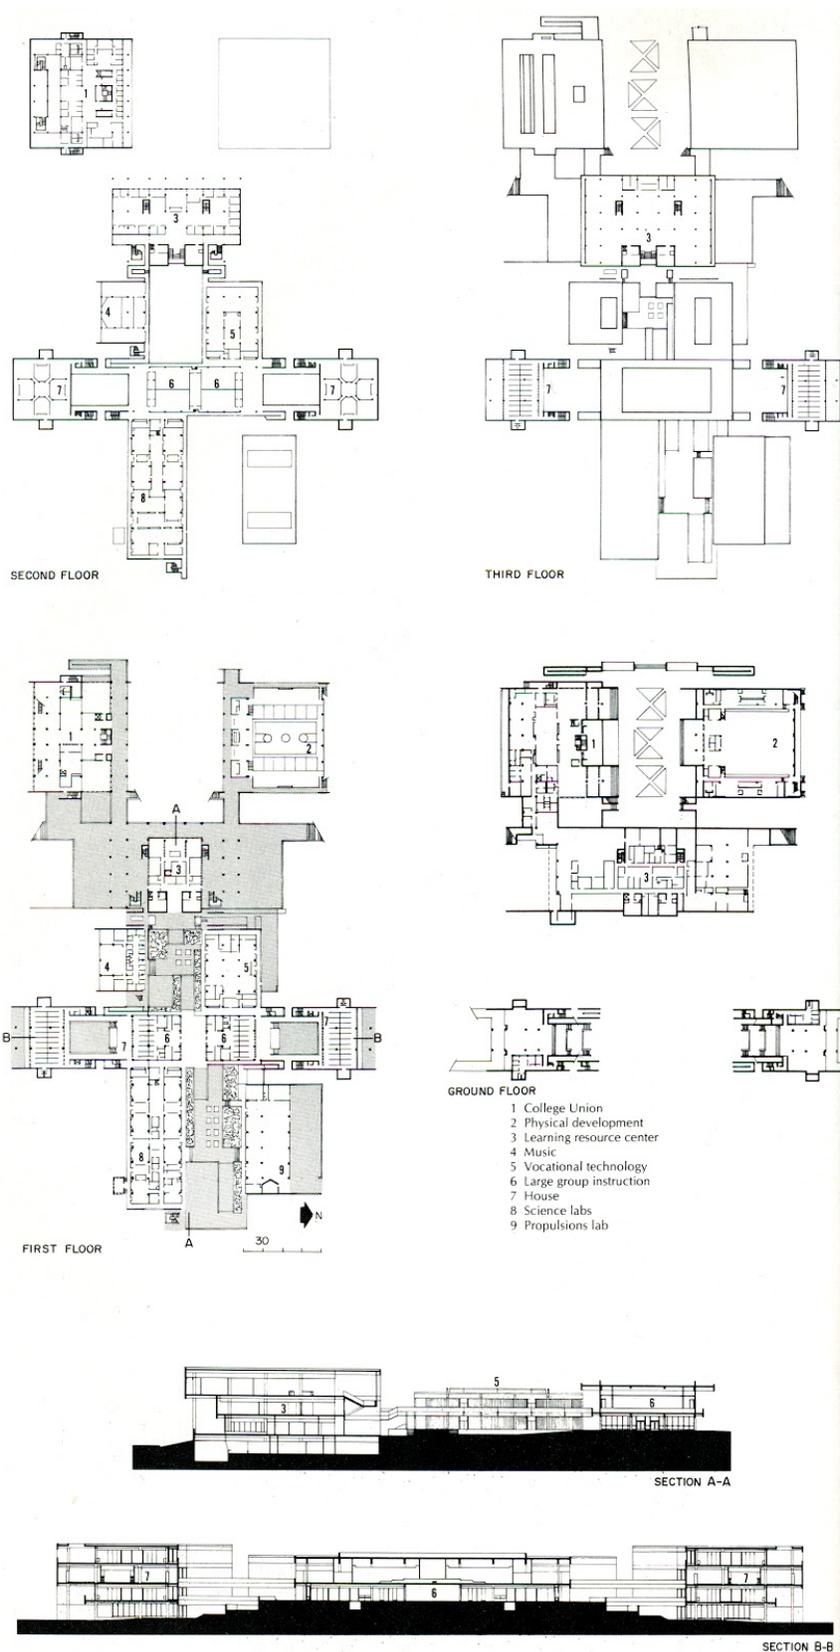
Pima Community College West Campus, plan and sections. 1970.
